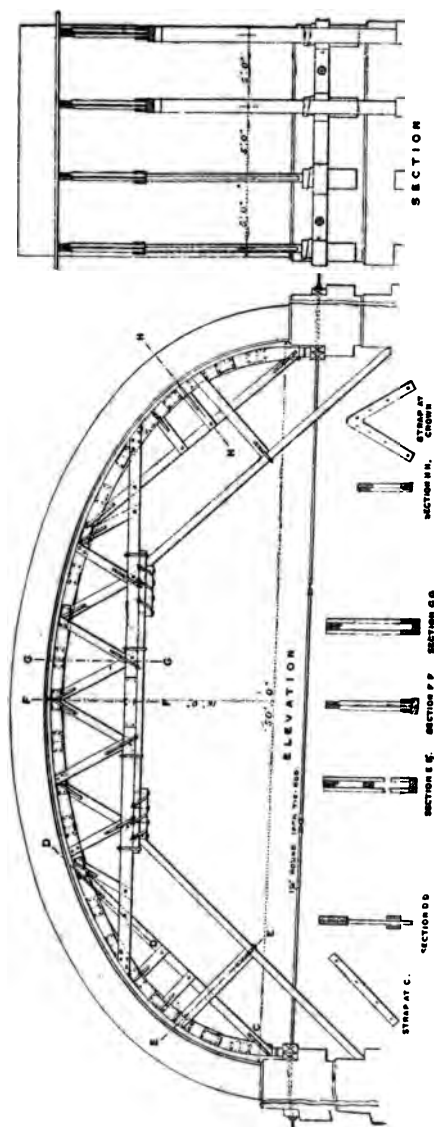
ELEVATION AND SECTIONS SHOWING CONSTRUCTION OF BOULDER-FACED CONCRETE-STEEL BRIDGE.
